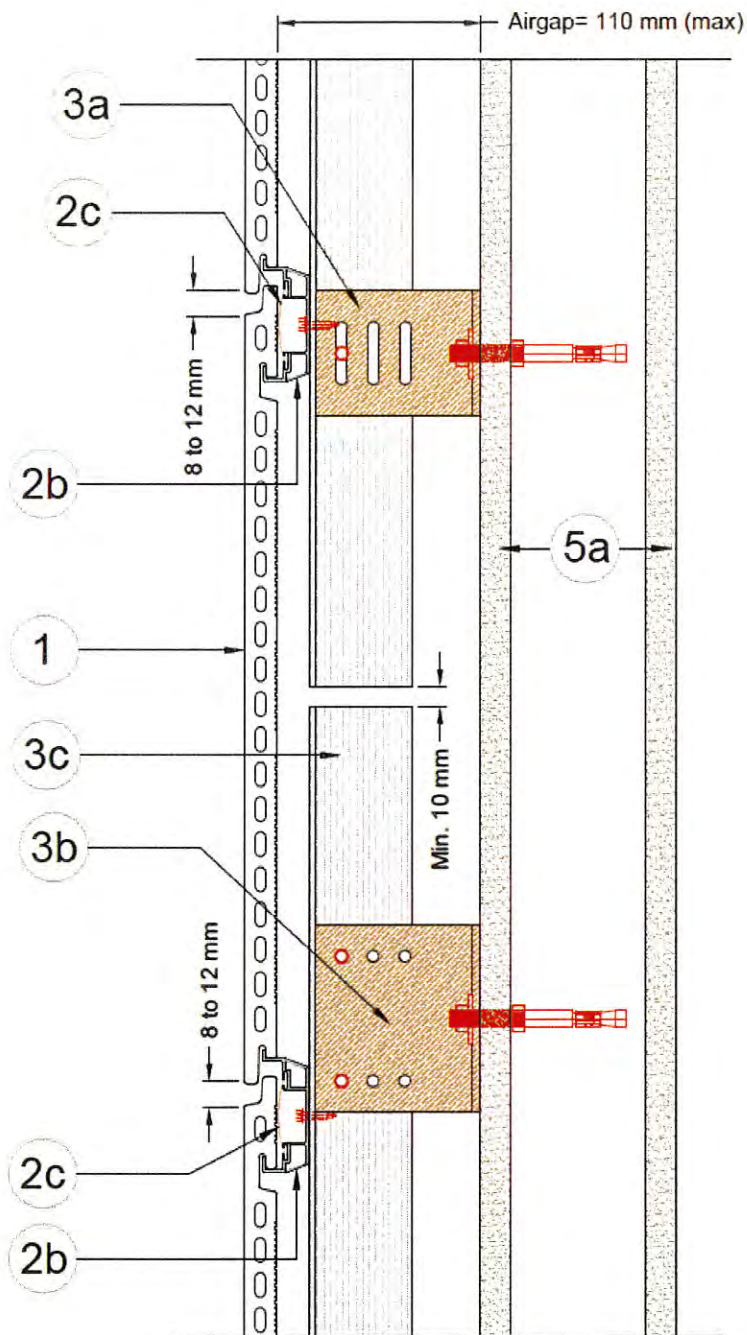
Non-load-bearing exterior wall cladding assembly typical vertical joint section details
